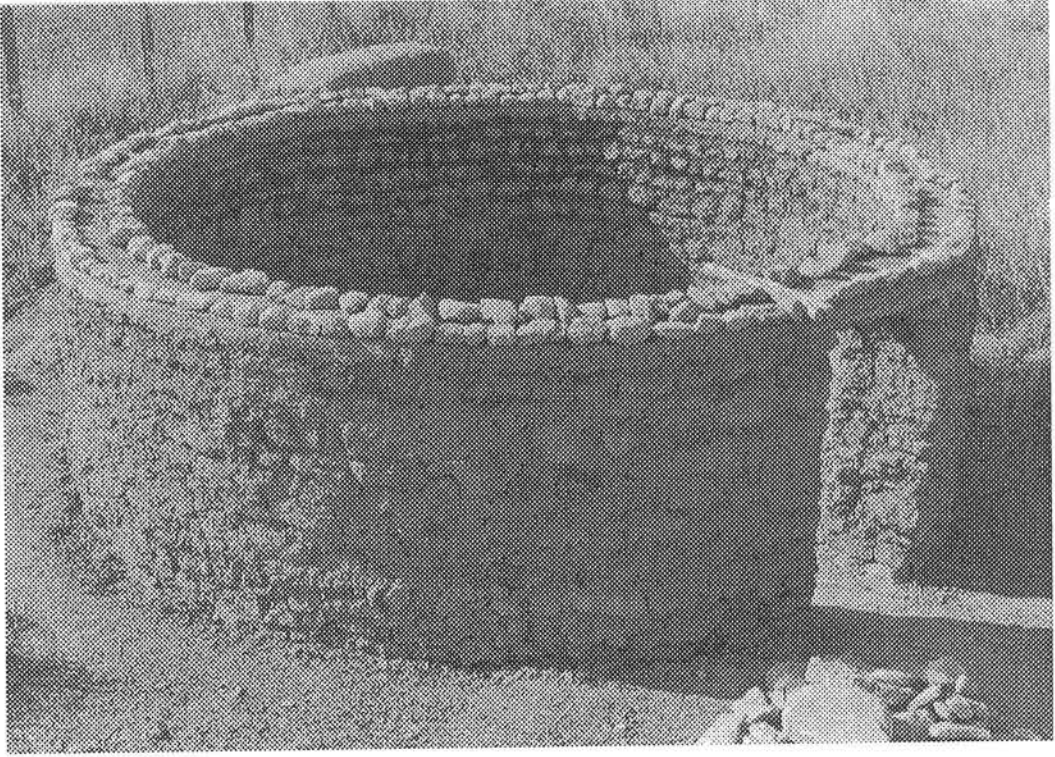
LEV, RH2 stonewall nearing completion with door lintel and bracket in place.
